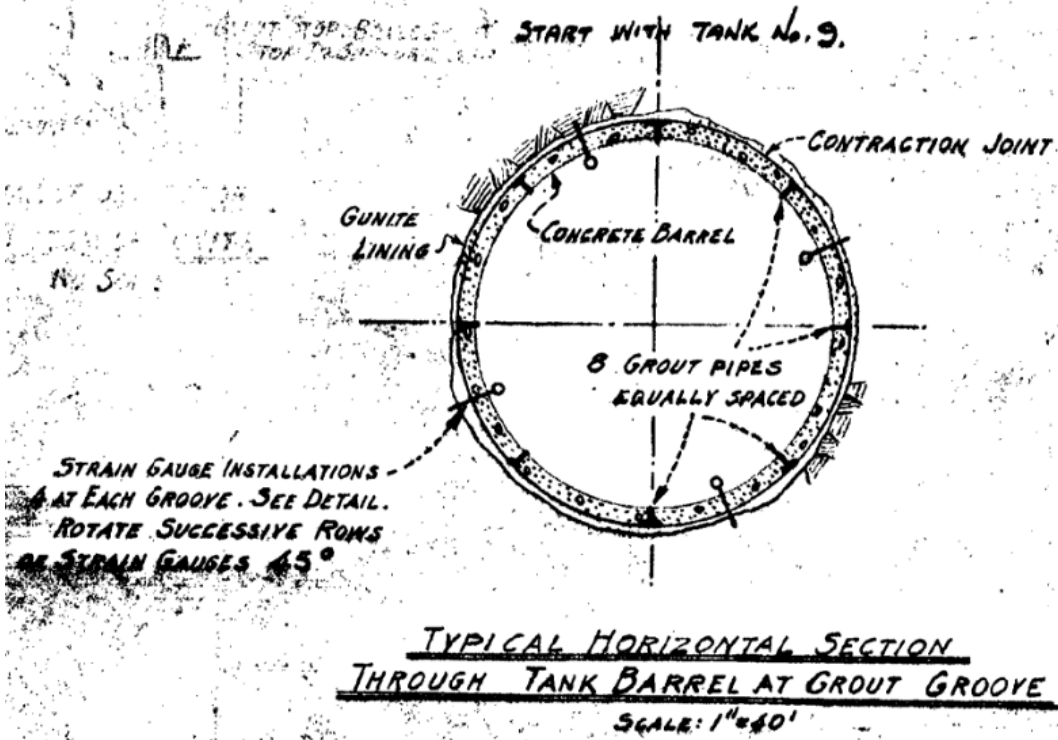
Typical Horizontal Section Through Tank Barrel at Grout Groove
